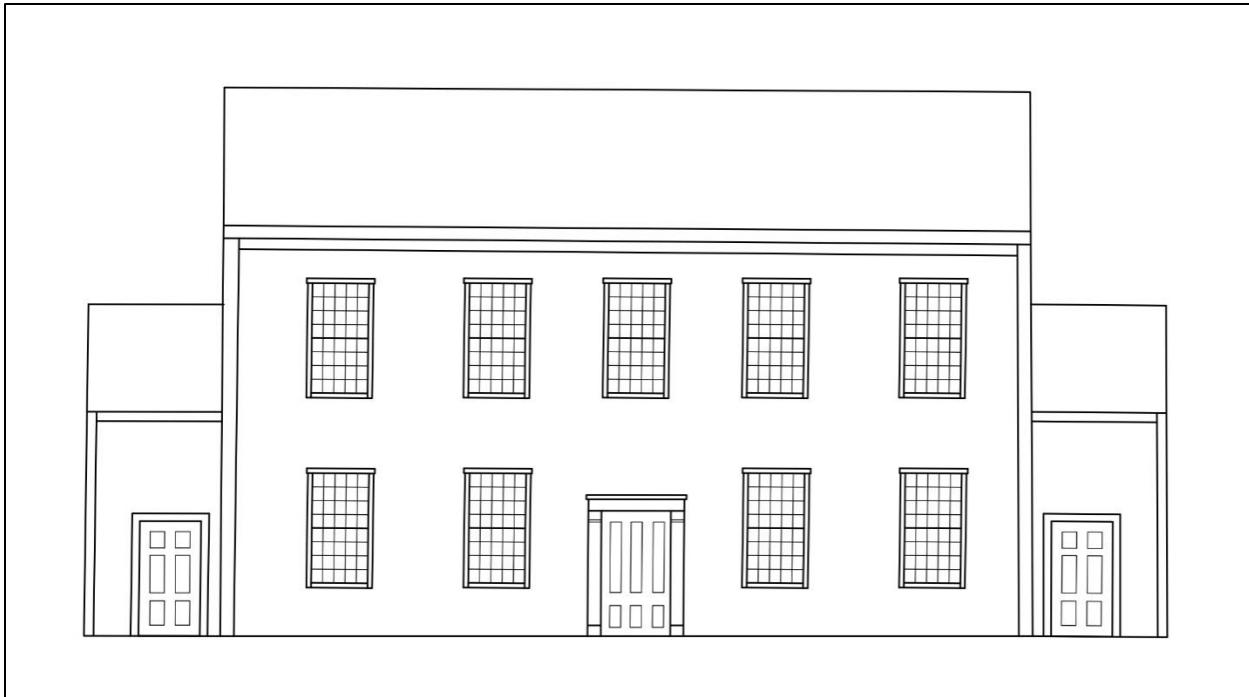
Conjectural Drawing of South Elevation of Windham Meetinghouse, ca. 1800
